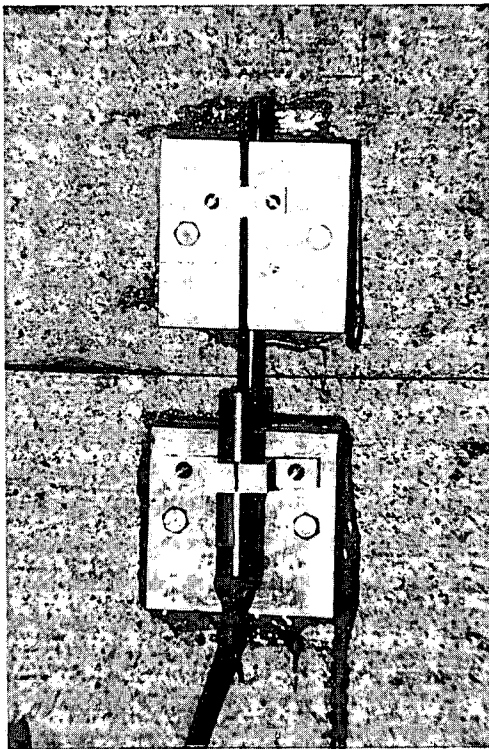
Close-up view of LVDT mounted across saw-cut fracture.
